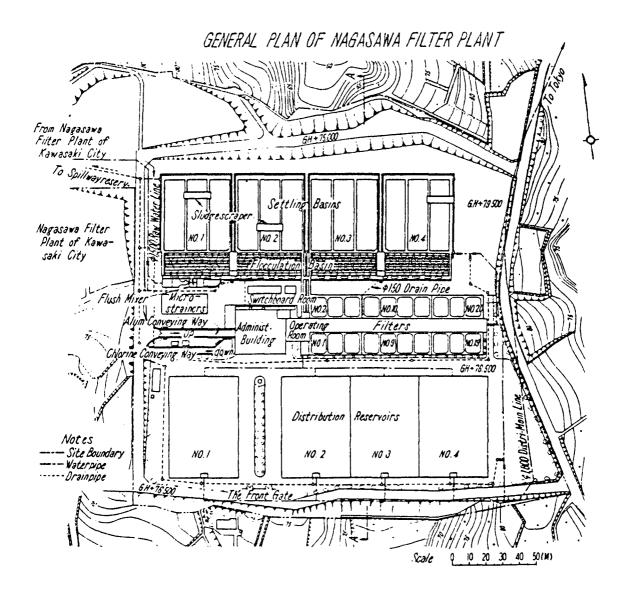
Plan of Water Treatment Facilitity in Japan
